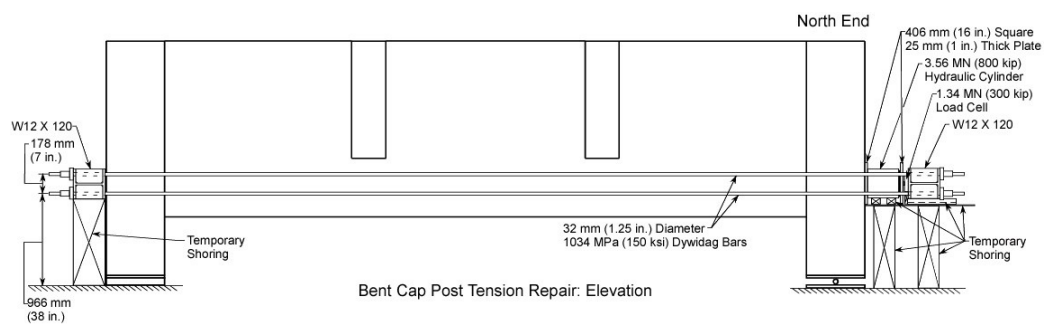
Specimen D.IT.C.PT repair elevation.
